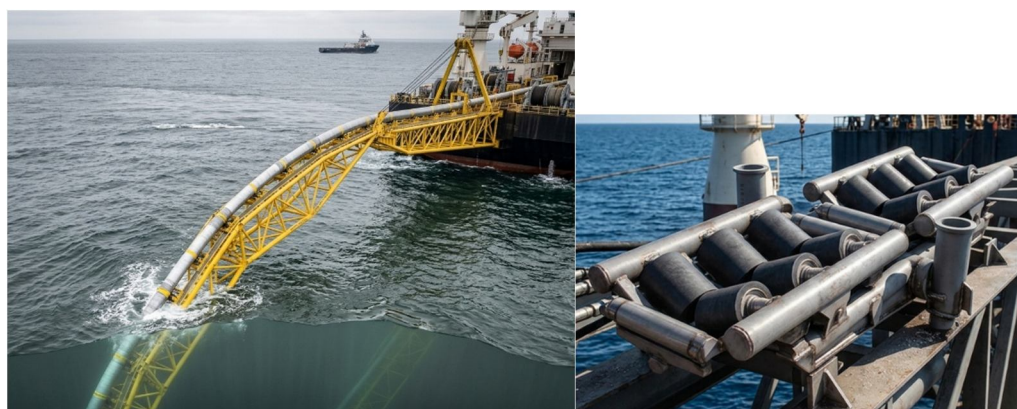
Typical S-Lay Vessel Stinger , Roller Box and Roller Arrangement Illustration (Representative Images)
